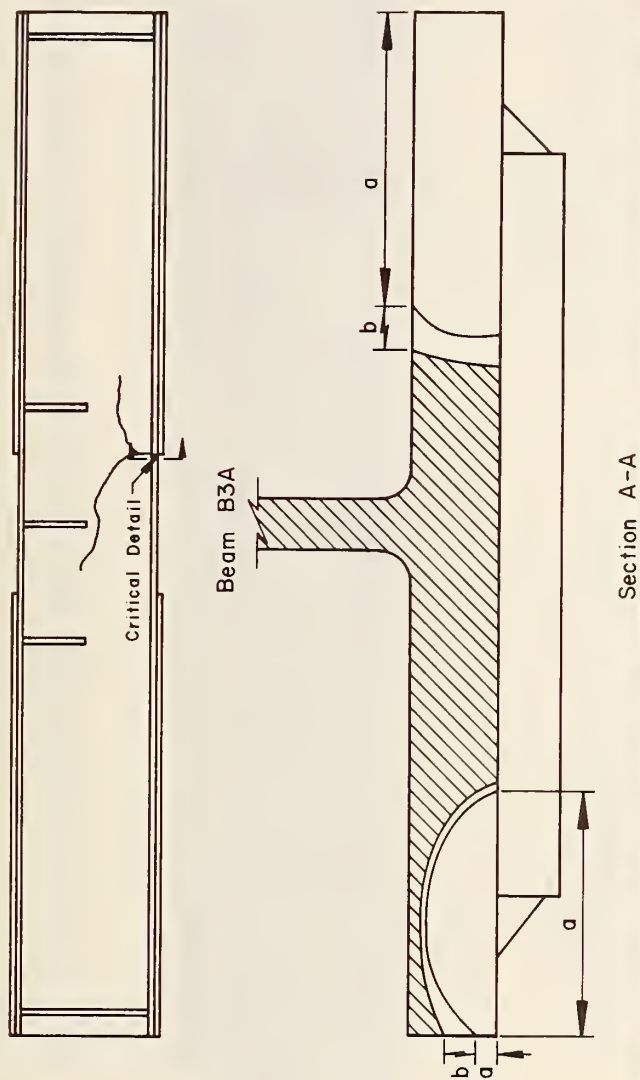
Fatigue and Fracture Surface, B3A (A36, W36X260)
